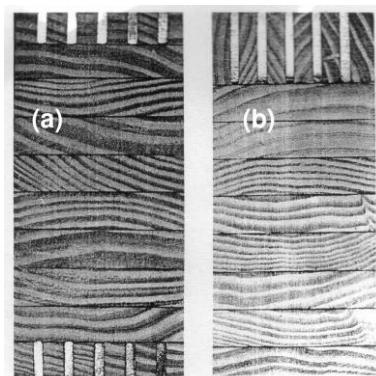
Vertically laminated steel-timber composite beams as tested by Borgin et al. (Alam, Reinforcement of Timber for Structural Application and Repair, 2004)
